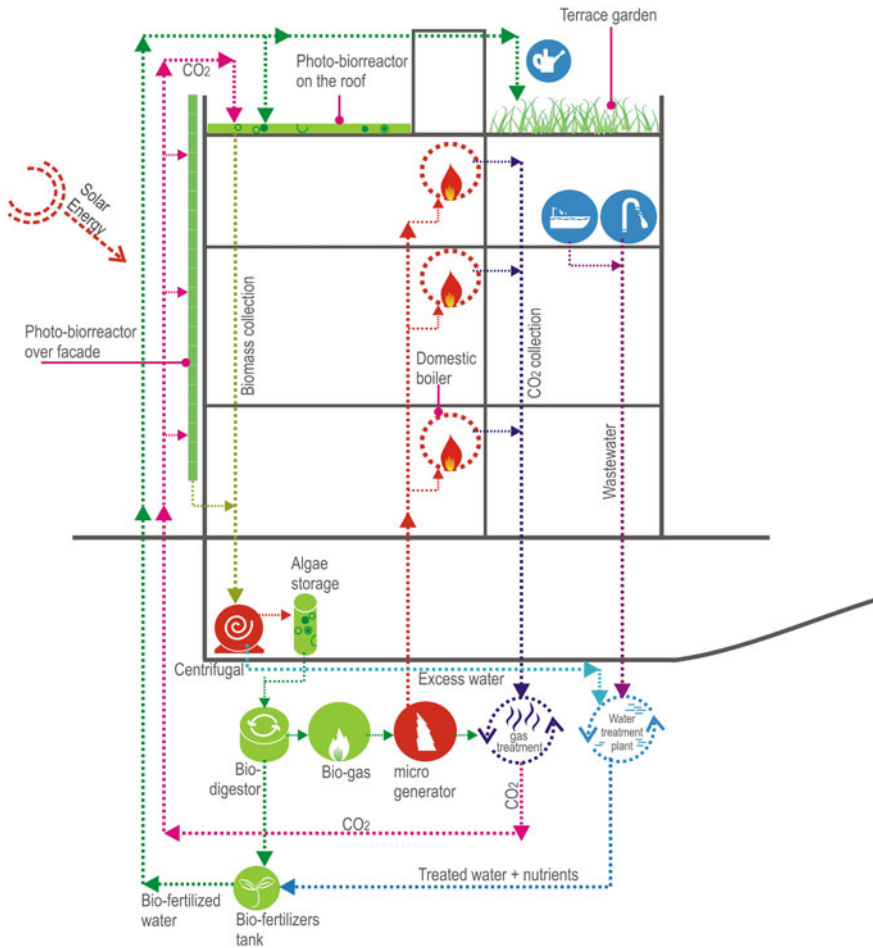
Building installation for A-PhBR (R. Cervera and J. Pioz)
